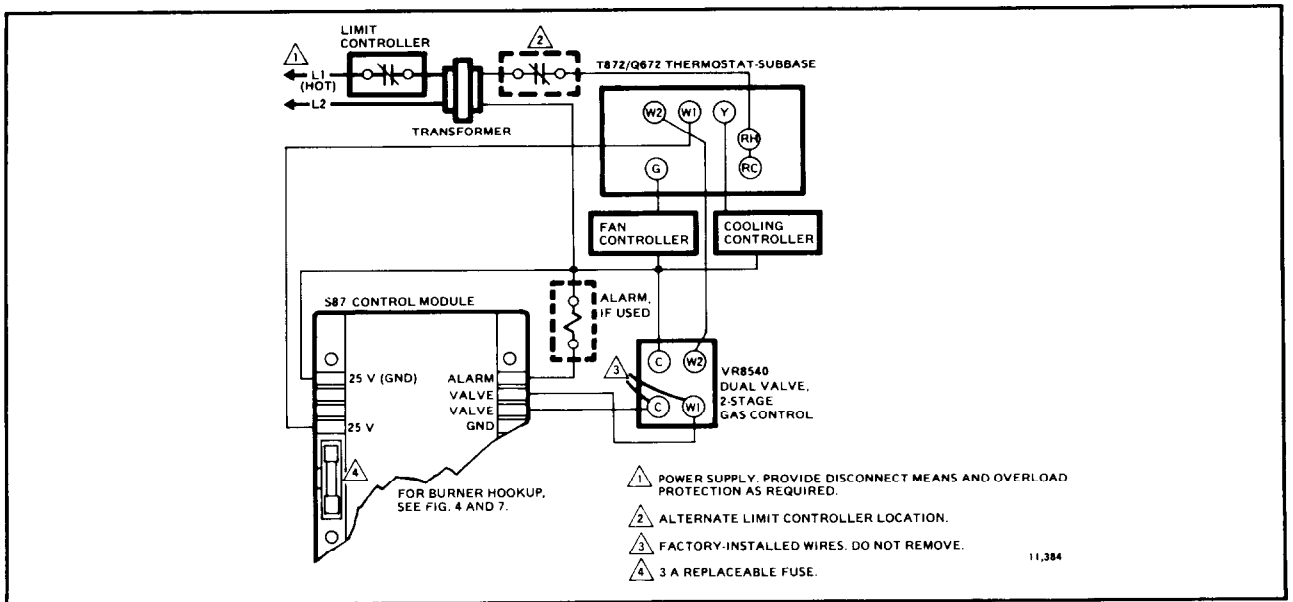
WIRING HOOKUP FOR Y343B PACKAGE IN A TYPICAL TWO-STAGE DSI HEATING SYSTEM.
